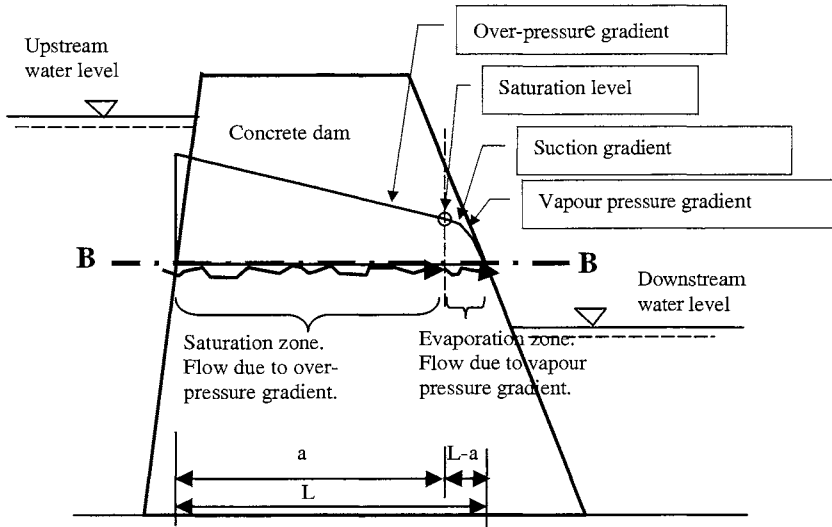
A principle sketch of a thick concrete dam and a combined water flow in a section B-B. In the section B-B, the upstream face is in water and the downstream face is in air. The section has one saturated zone and one evaporation zone Fagerlund (2000).
